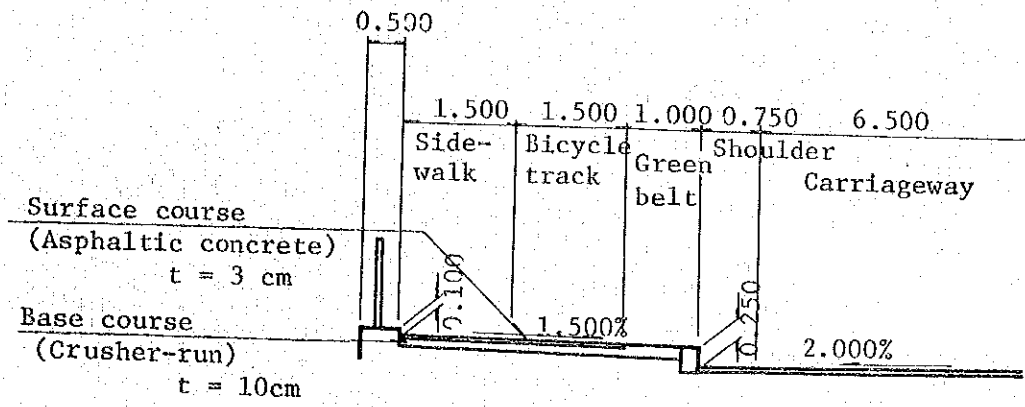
Pavement Structure of Sidewalk/Bicycle Track in Bridge Section
